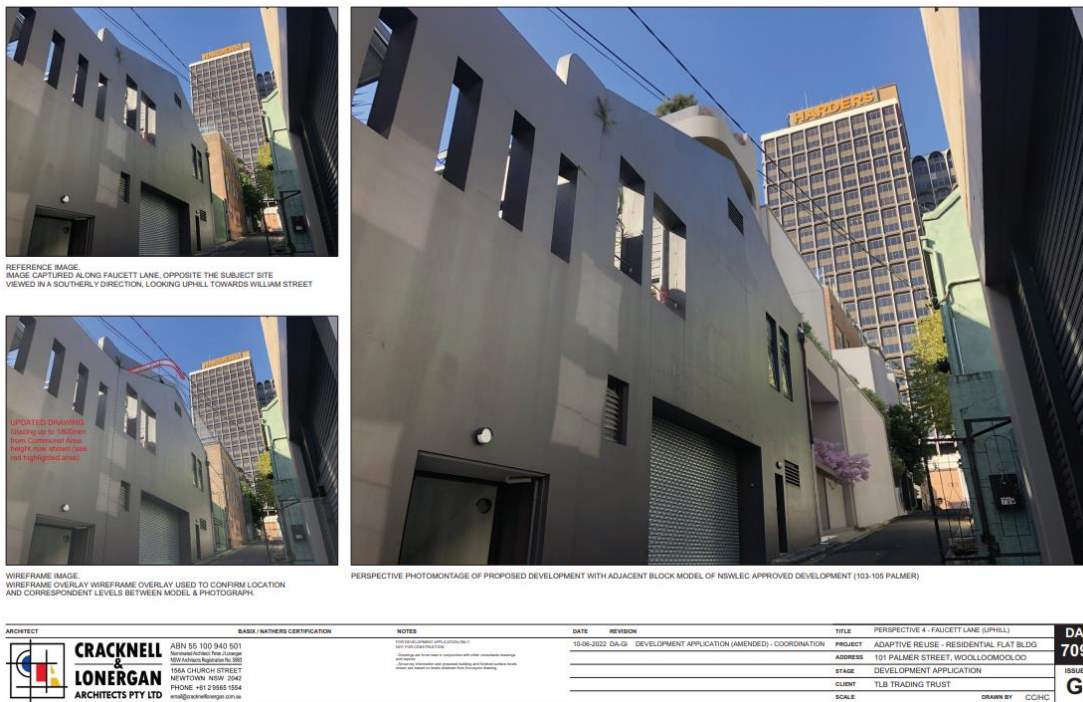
Proposed photomontage viewed from the western side of Faucett Ln, looking south-east (block model of NSW LEC approval shown adjacent)
